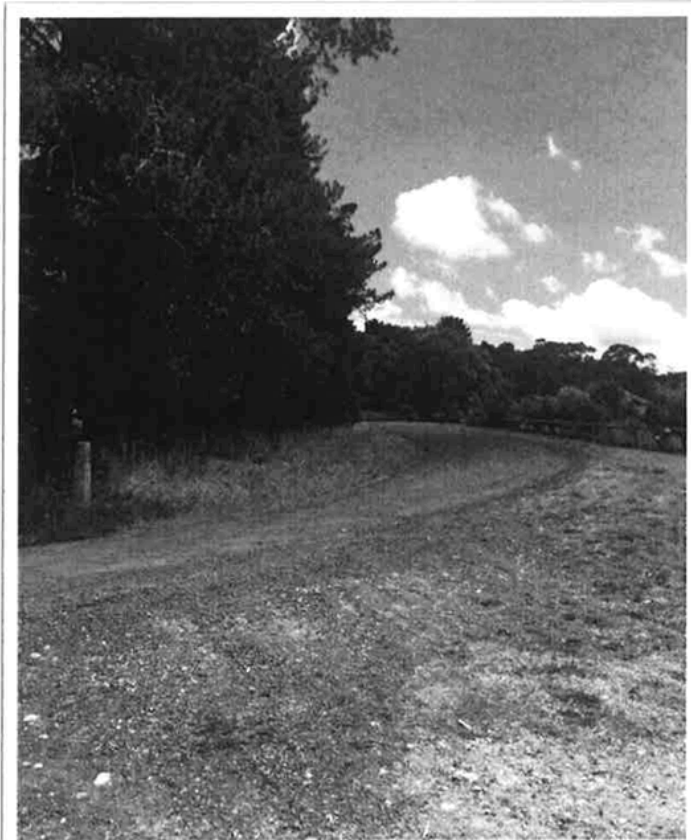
Intersection of access road and Mount Lofty Road. Proposed service and customer exit point for the development
